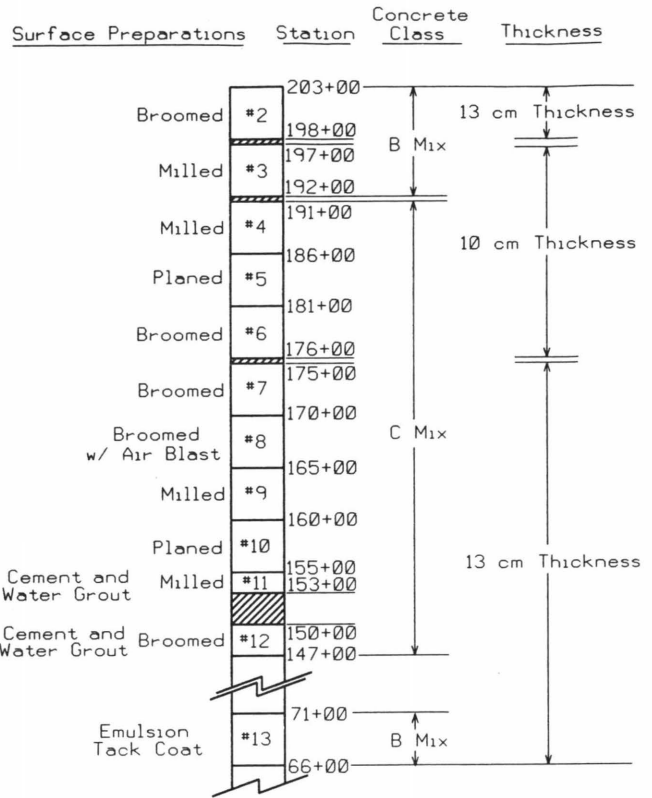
Test sections layout (1 cm = 0.394 in.).
